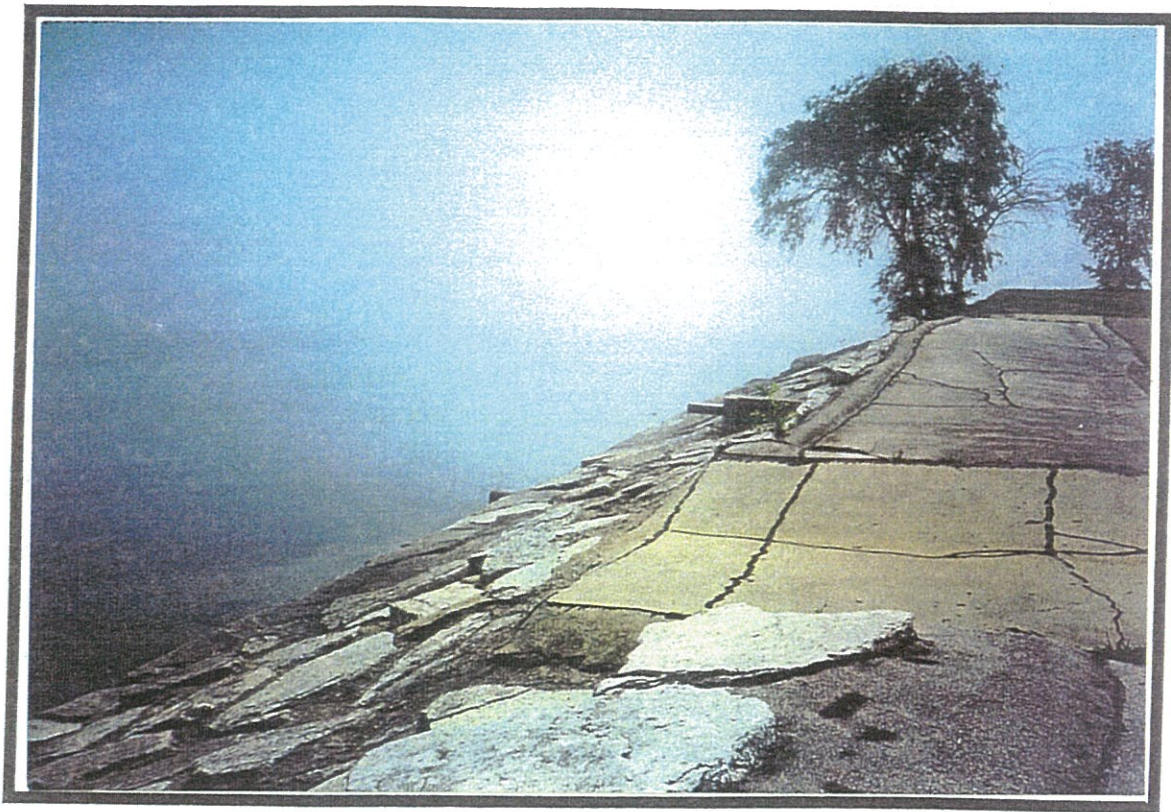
CONCRETE PROTECTION & FLAT STONES
